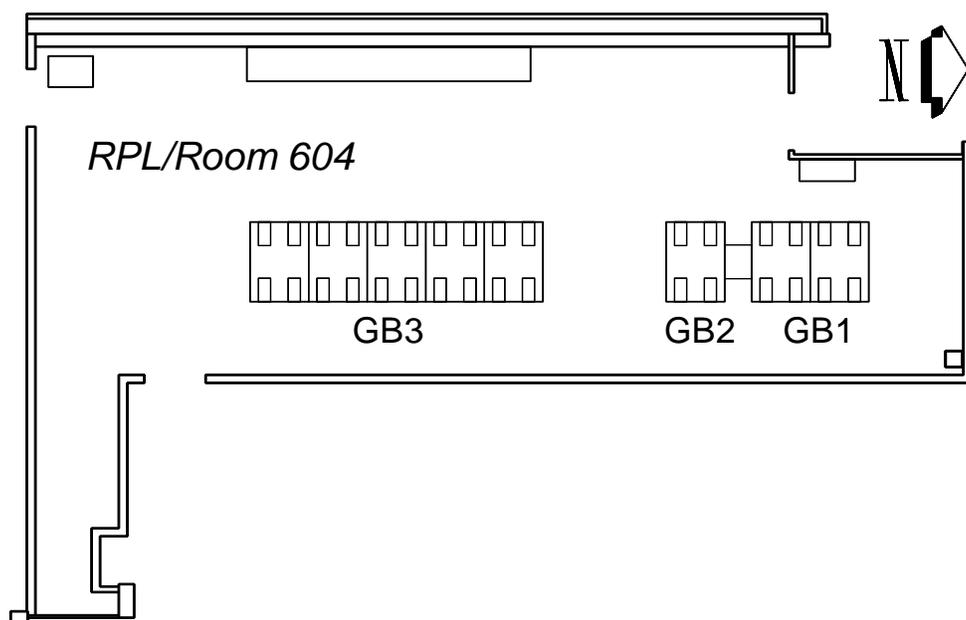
Layout of RPL Room 604 (GB Denotes Glovebox)
